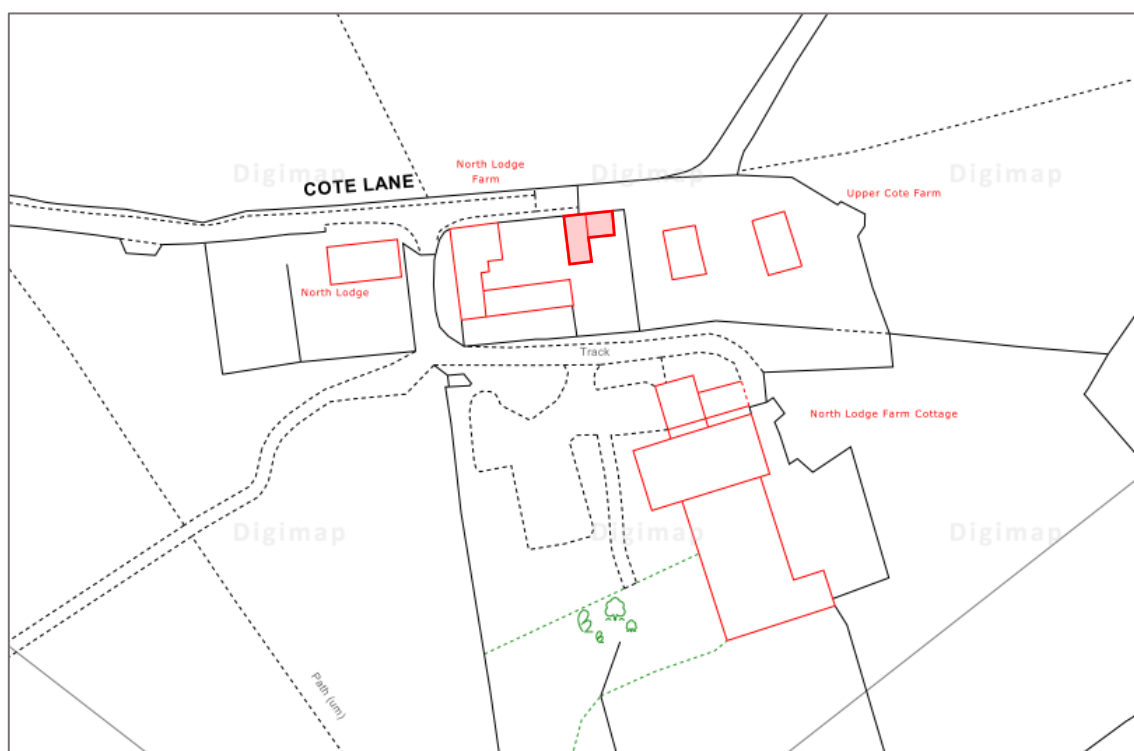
Site plan showing The Mistal (infilled in red) and surrounding buildings.
